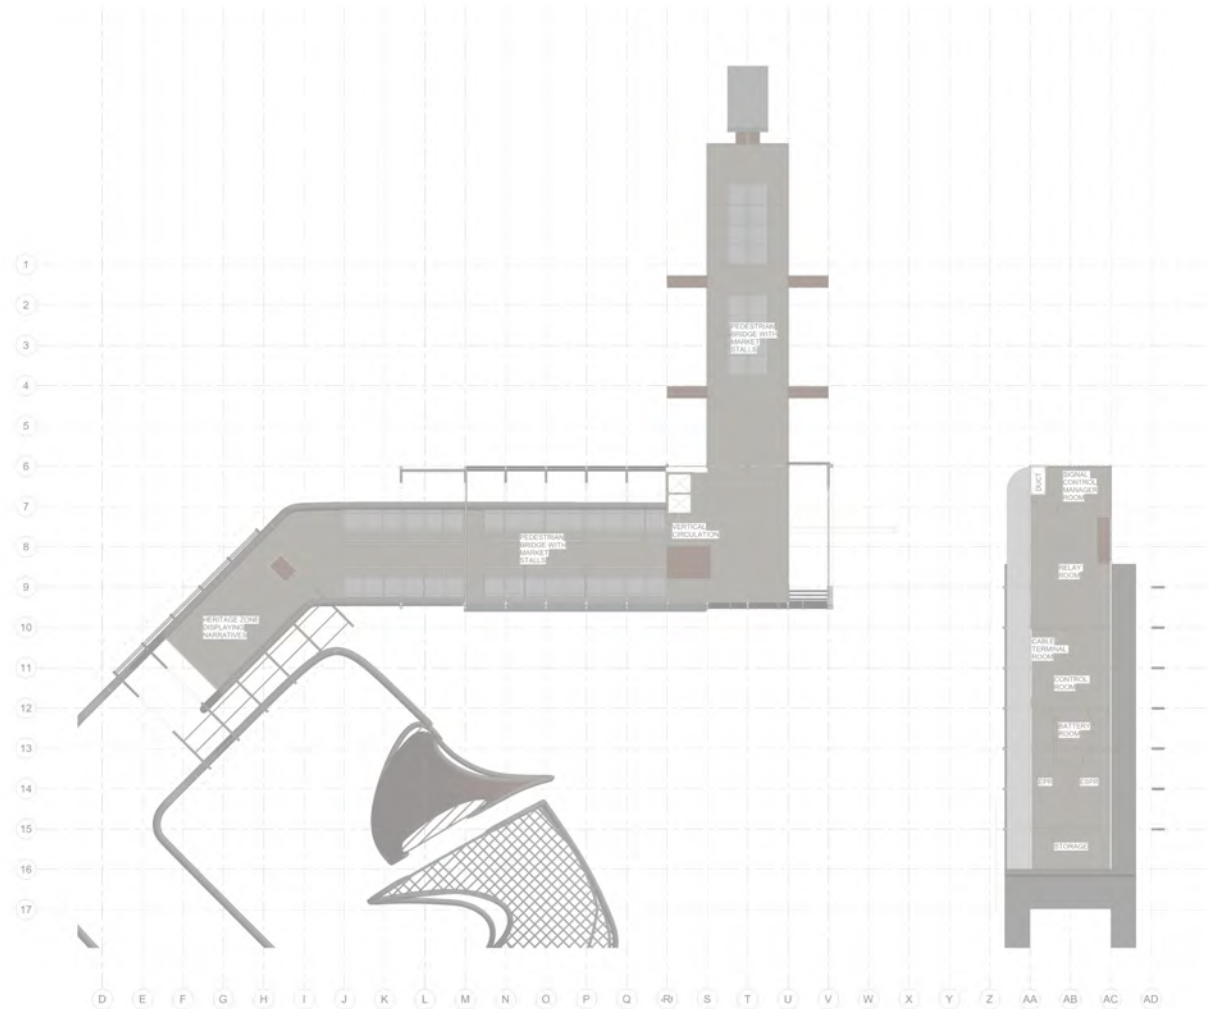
FIRST FLOOR PLAN (Author, 2017)
